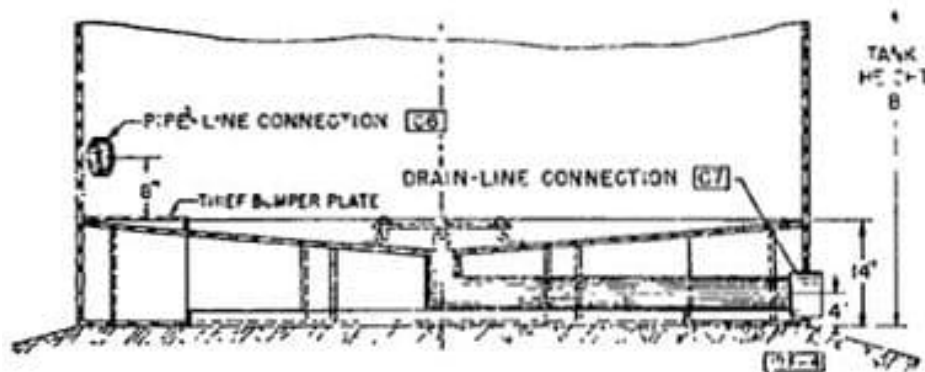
Skirted Cone Bottom Drain-line⁴on Breakout Tank
